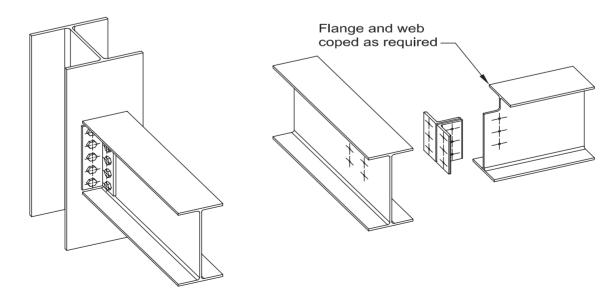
TYPICAL ANGLE CLEAT CONNECTIONS
